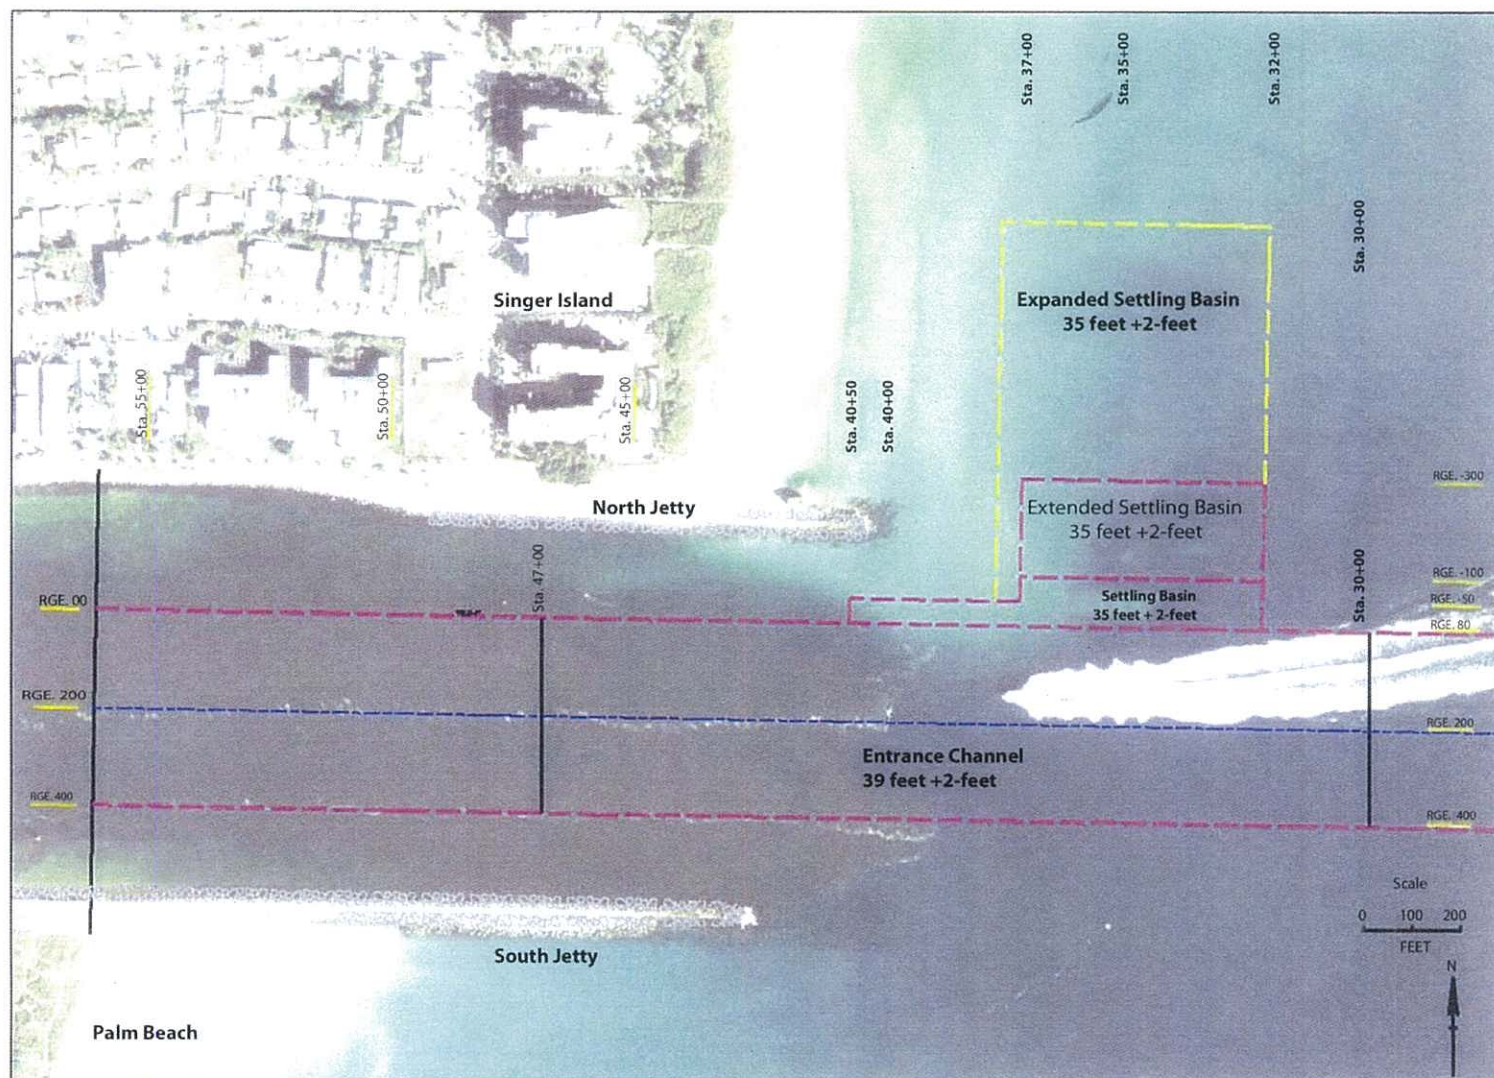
Location of the entrance channel, existing settling basin, and expanded settling basin, Lake Worth Inlet, Palm Beach County, Florida.
